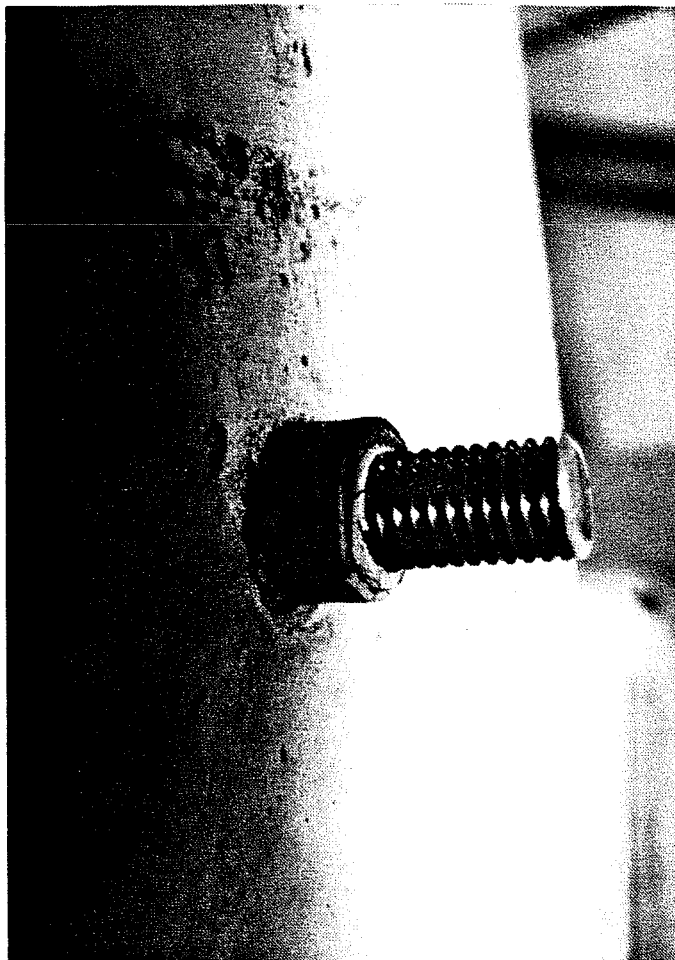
Adhesive filler intact on the unfailed end of the rod
